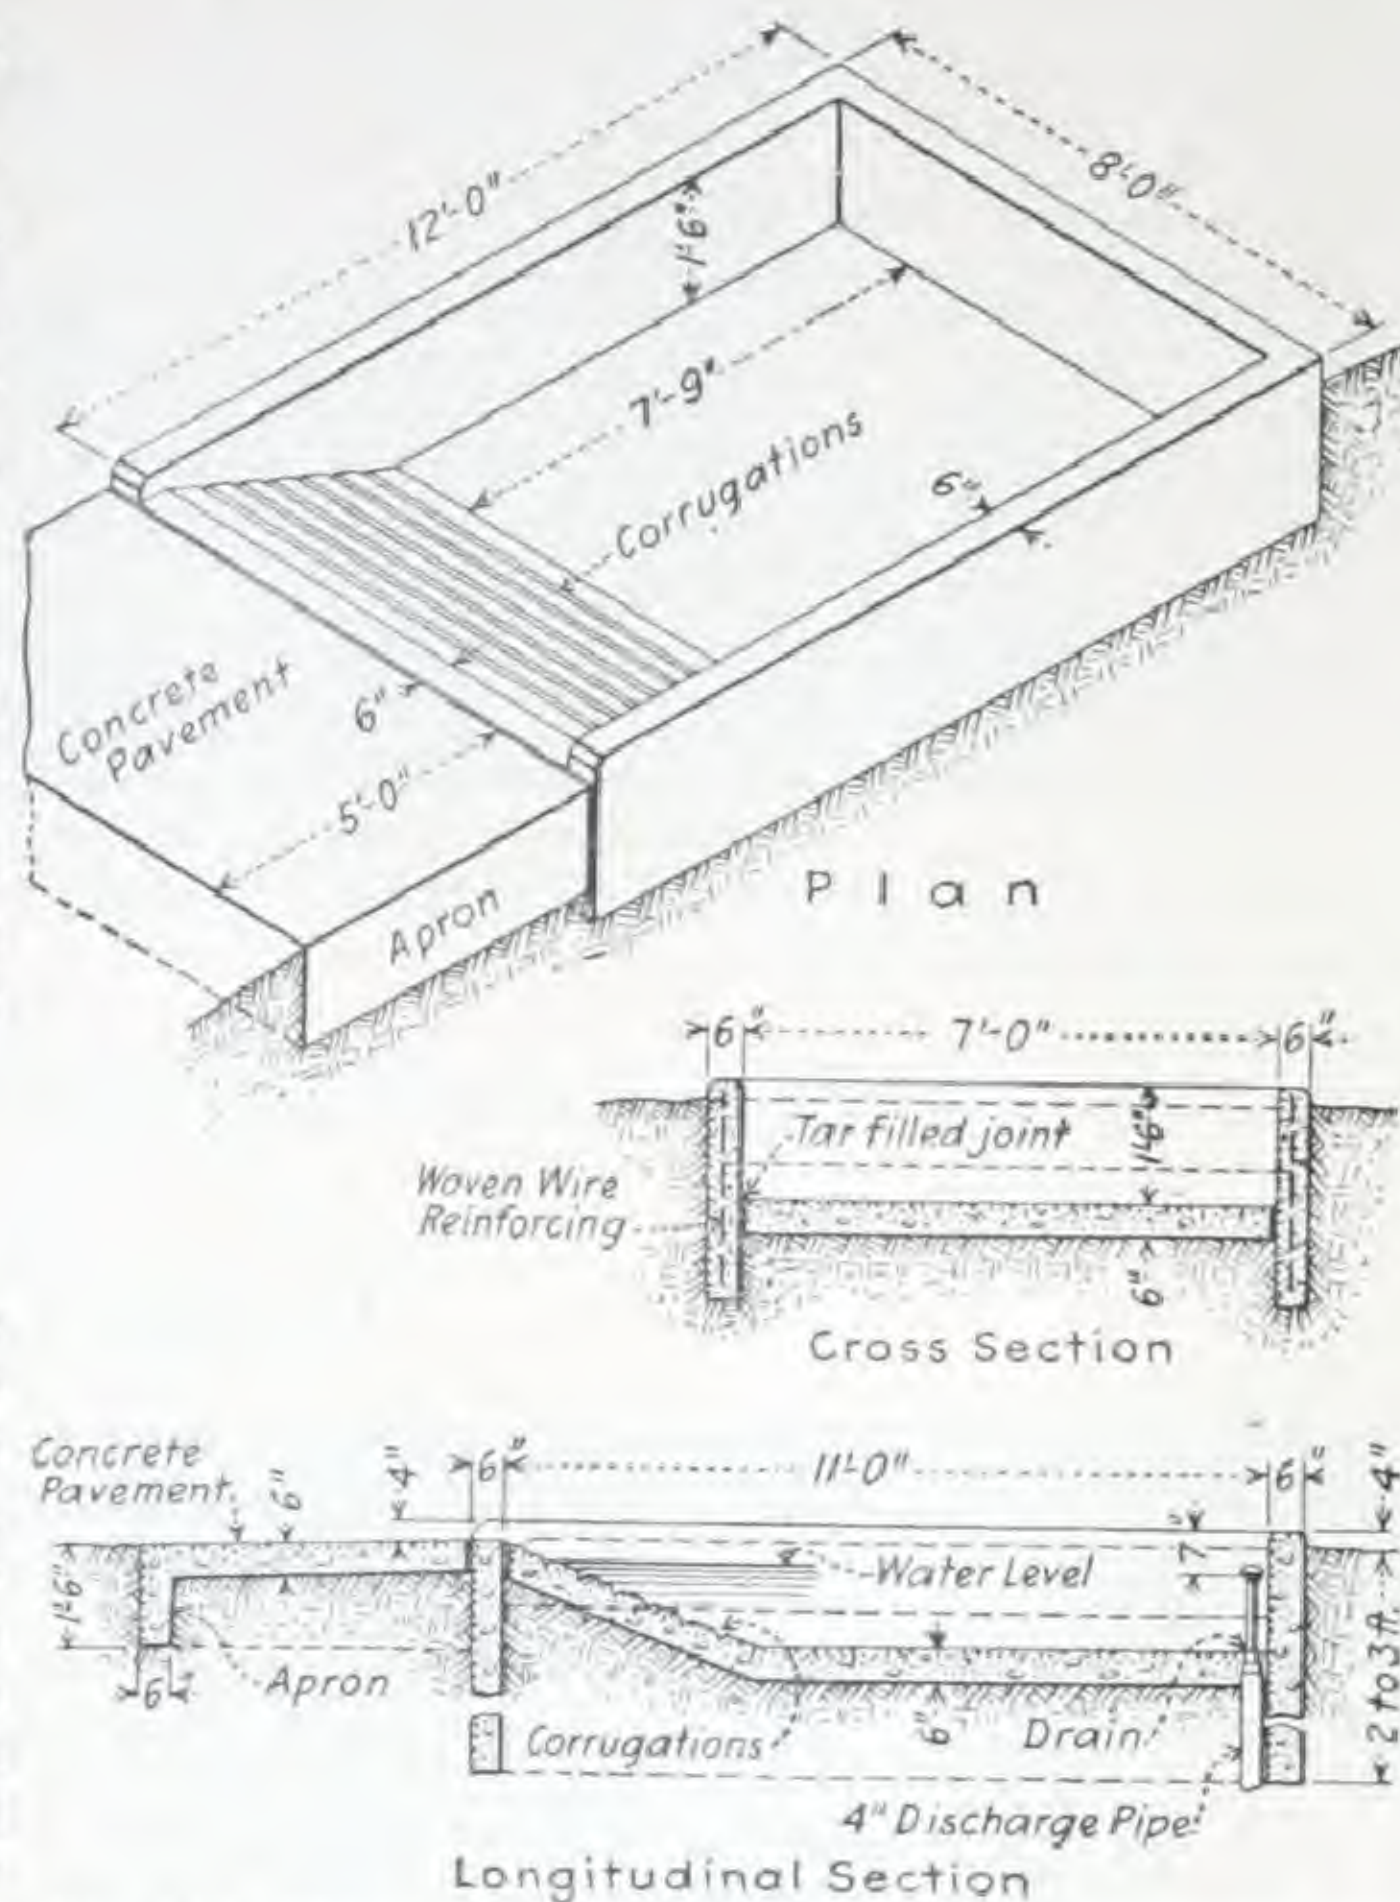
Details of hog wallow showing dimensions, corrugated incline, concrete pavement and apron.
